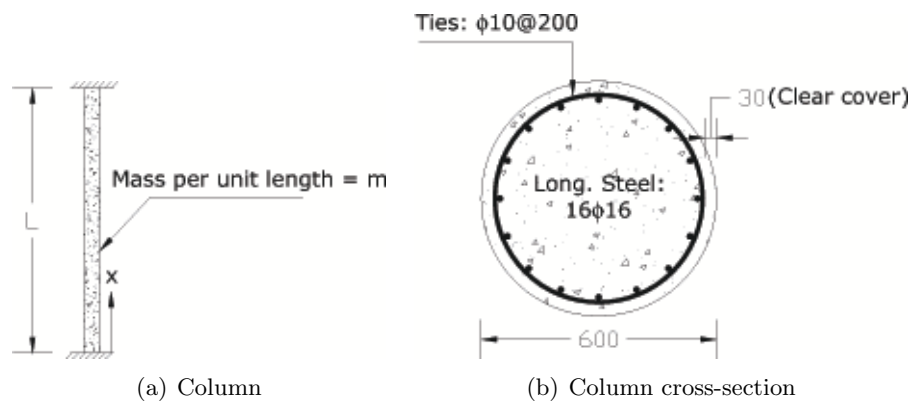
Cross-section for the RC column with reinforcing bars (All dimensions are in mm).
